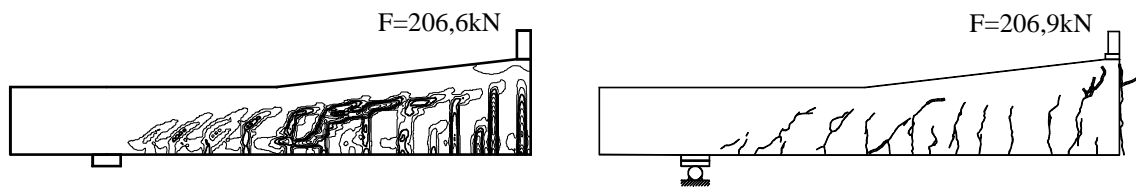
Crack propagation at failure of test beam 4L2 from Non-FEM and test
